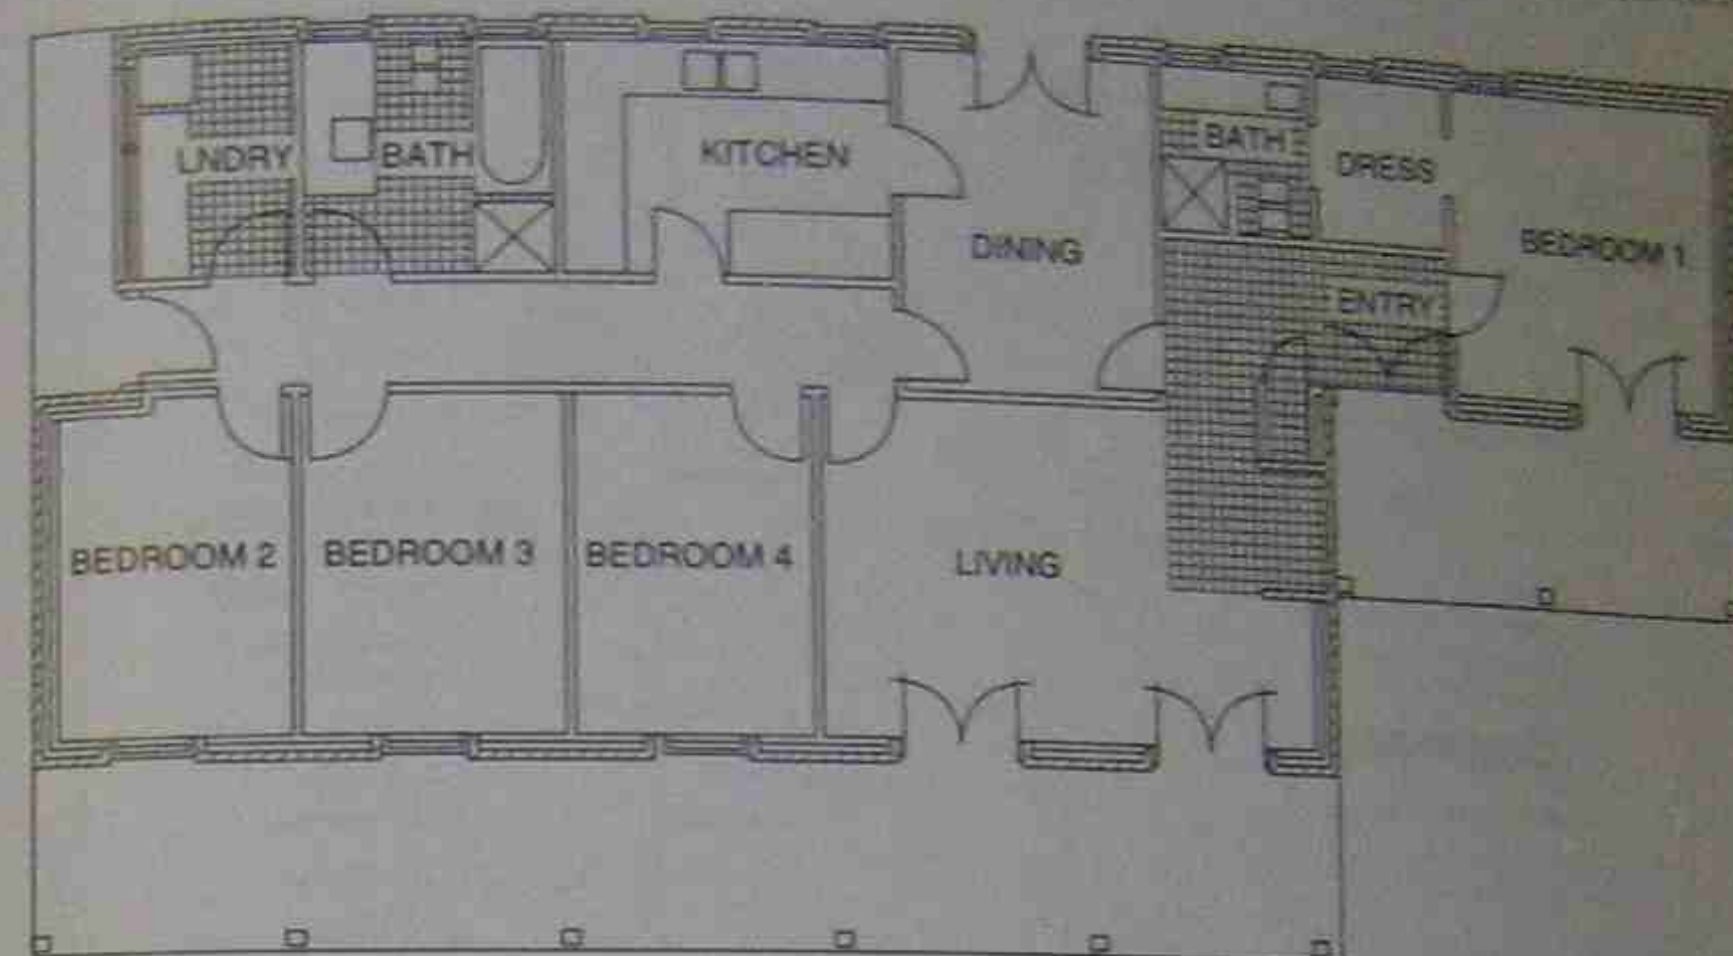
• Floor plan derived from a horizontal section of Figure 17.15
